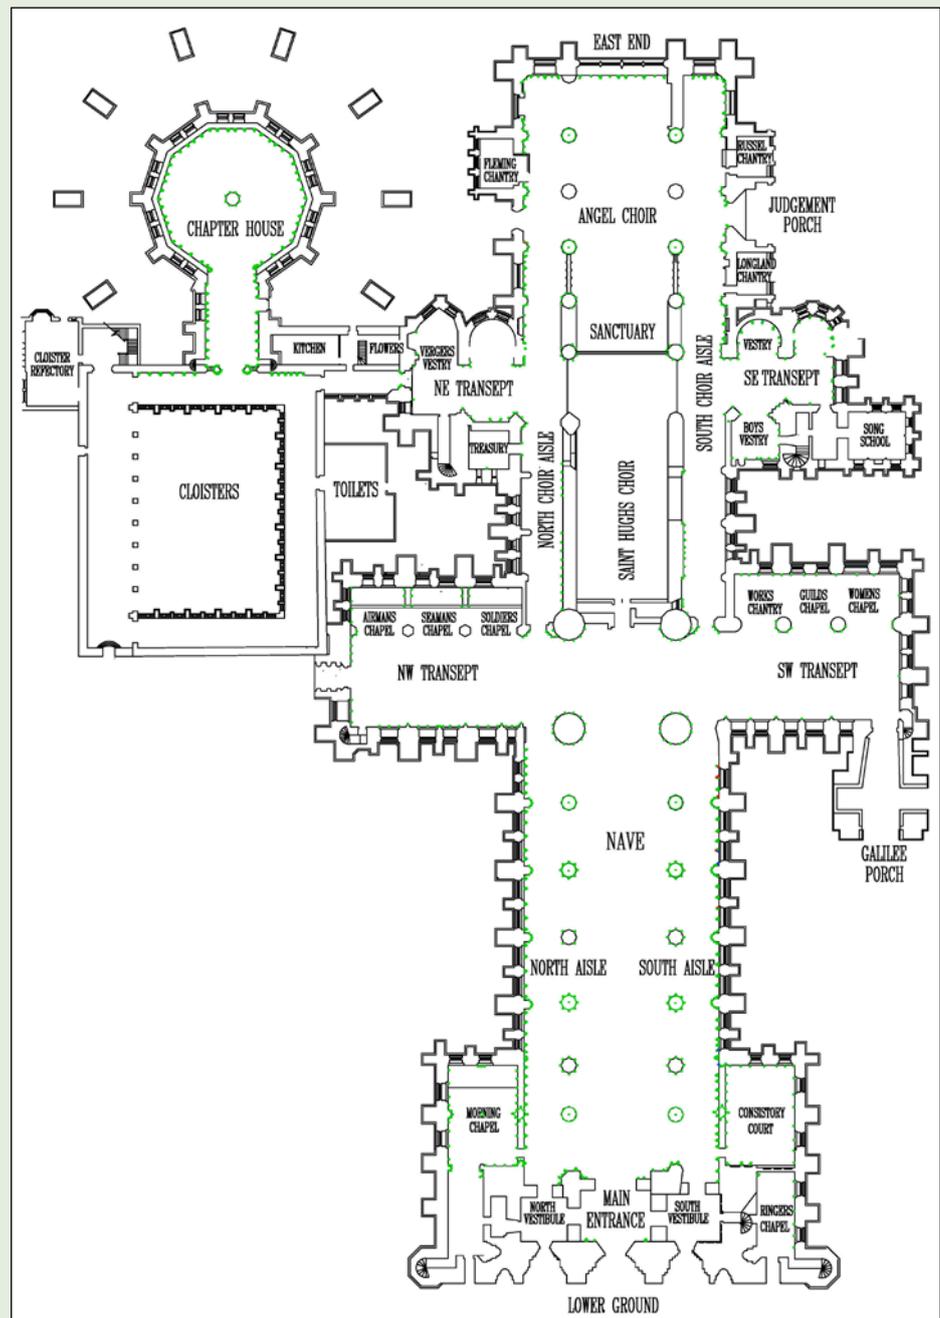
A ground floor plan of Lincoln Cathedral showing the location of Purbeck Marble elements.
